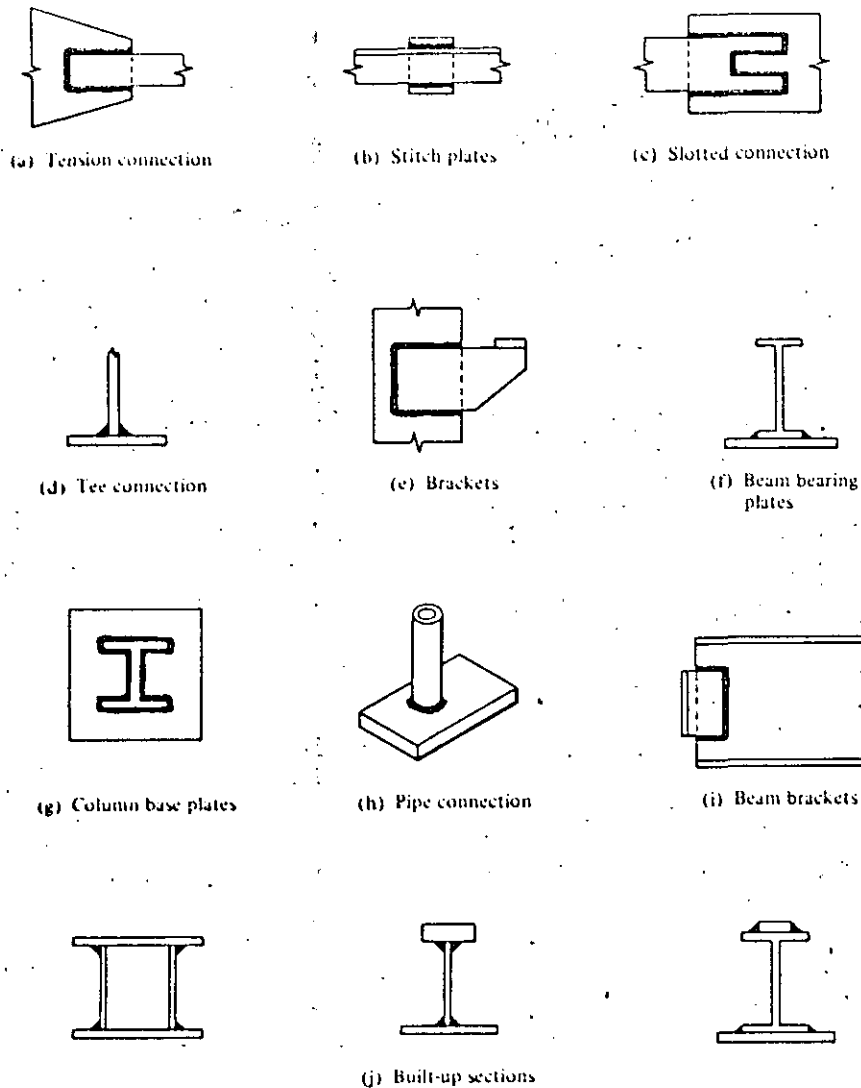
Typical uses of fillet welds.
